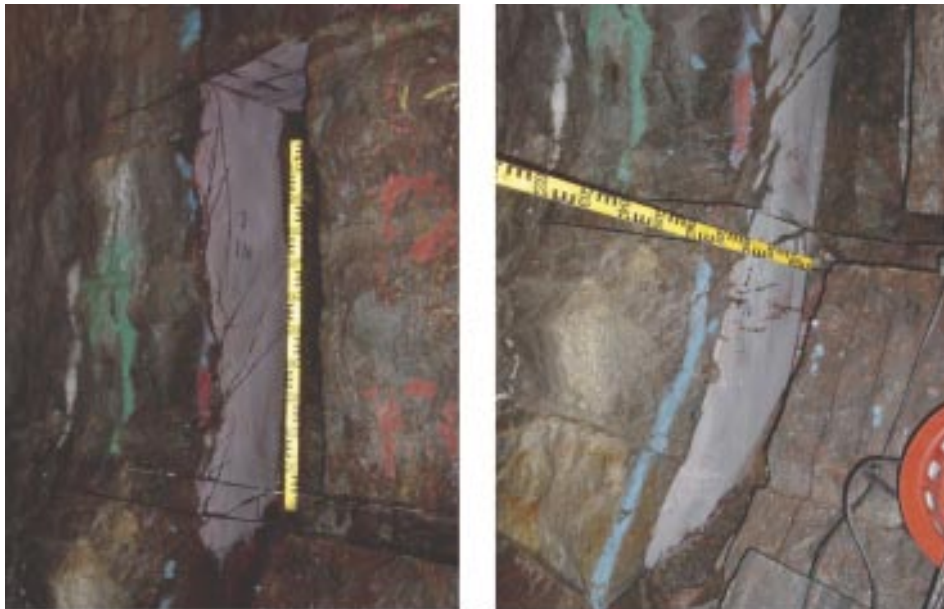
Example of EDZ as observed by sawing a slot in the tunnel wall after excavating the TASQ tunnel at the Äspö HRL.
